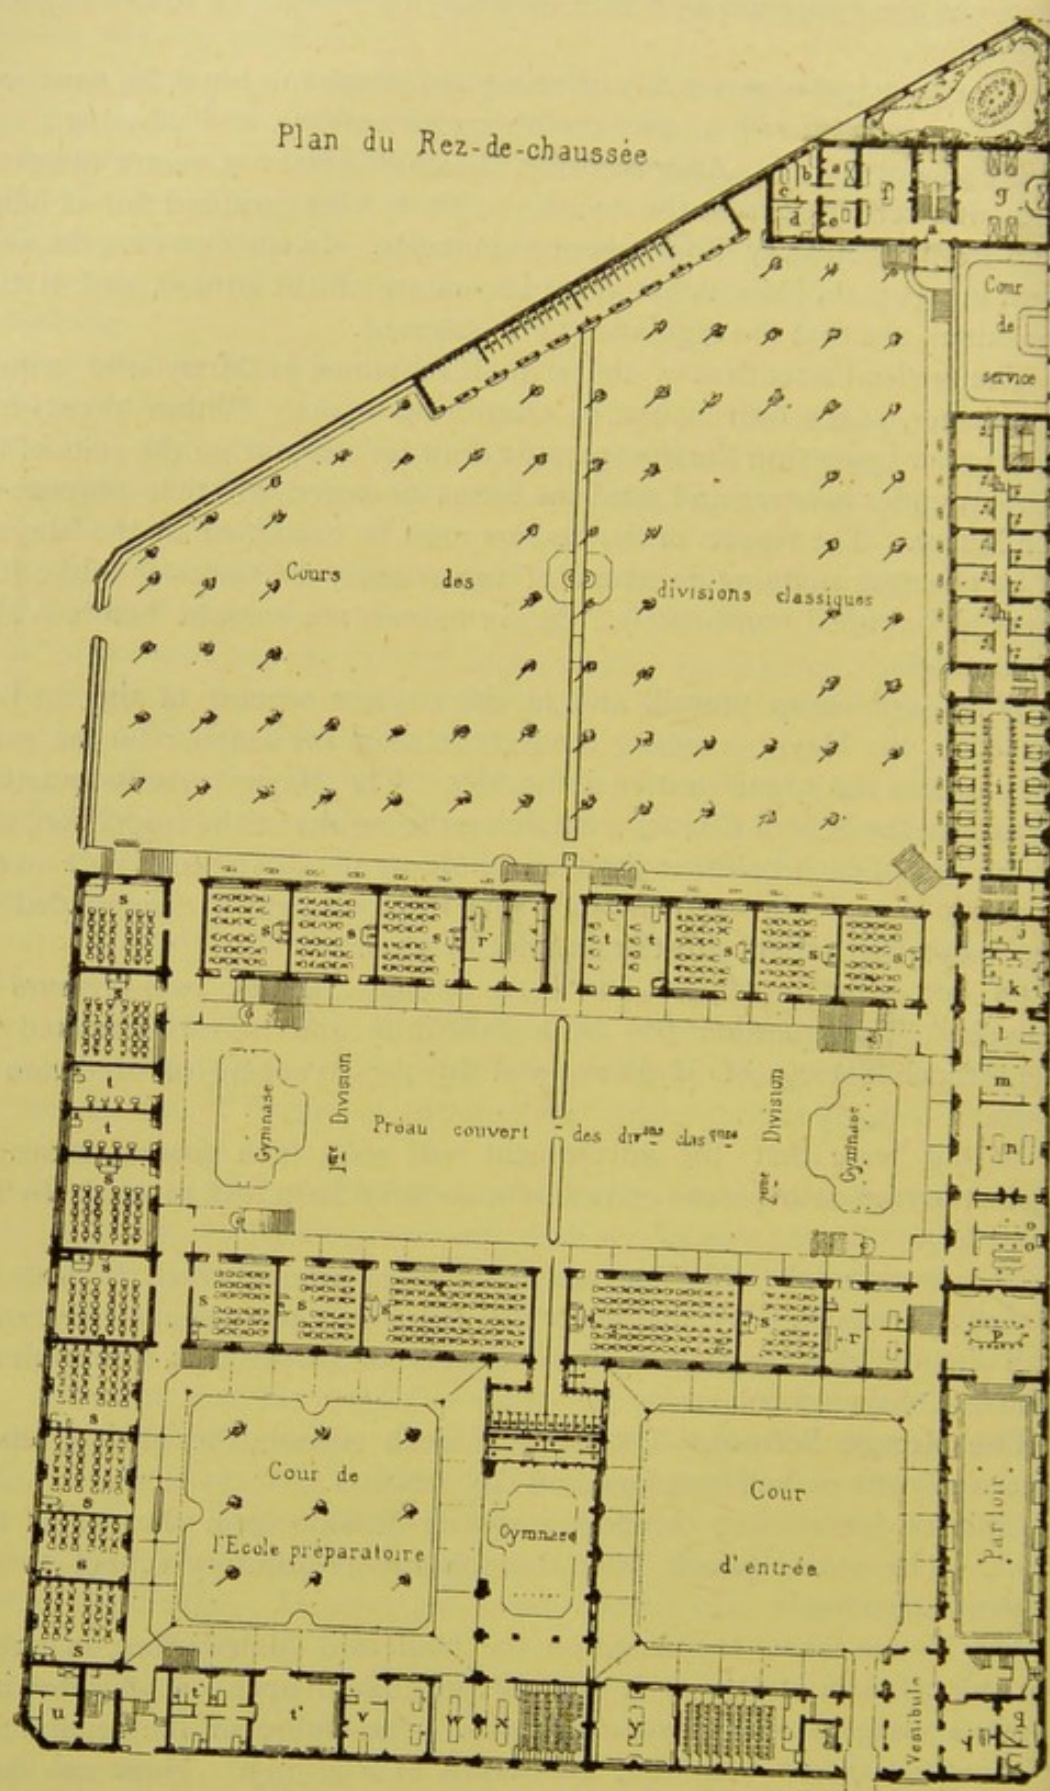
PLAN OF THE MONGE SCHOOL.
